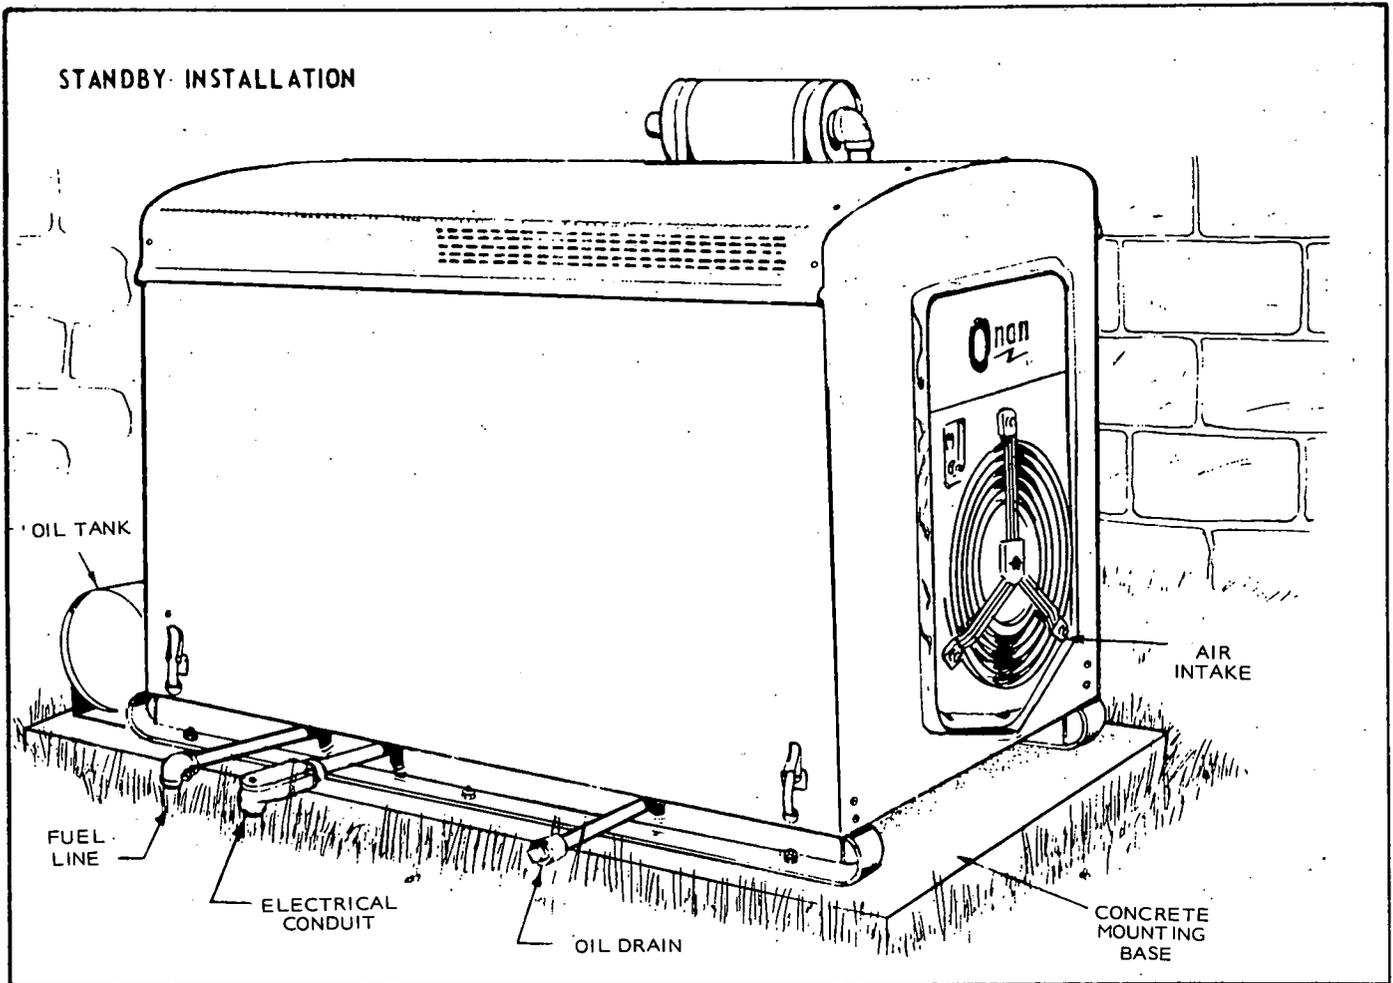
TYPICAL OUTDOOR INSTALLATION
